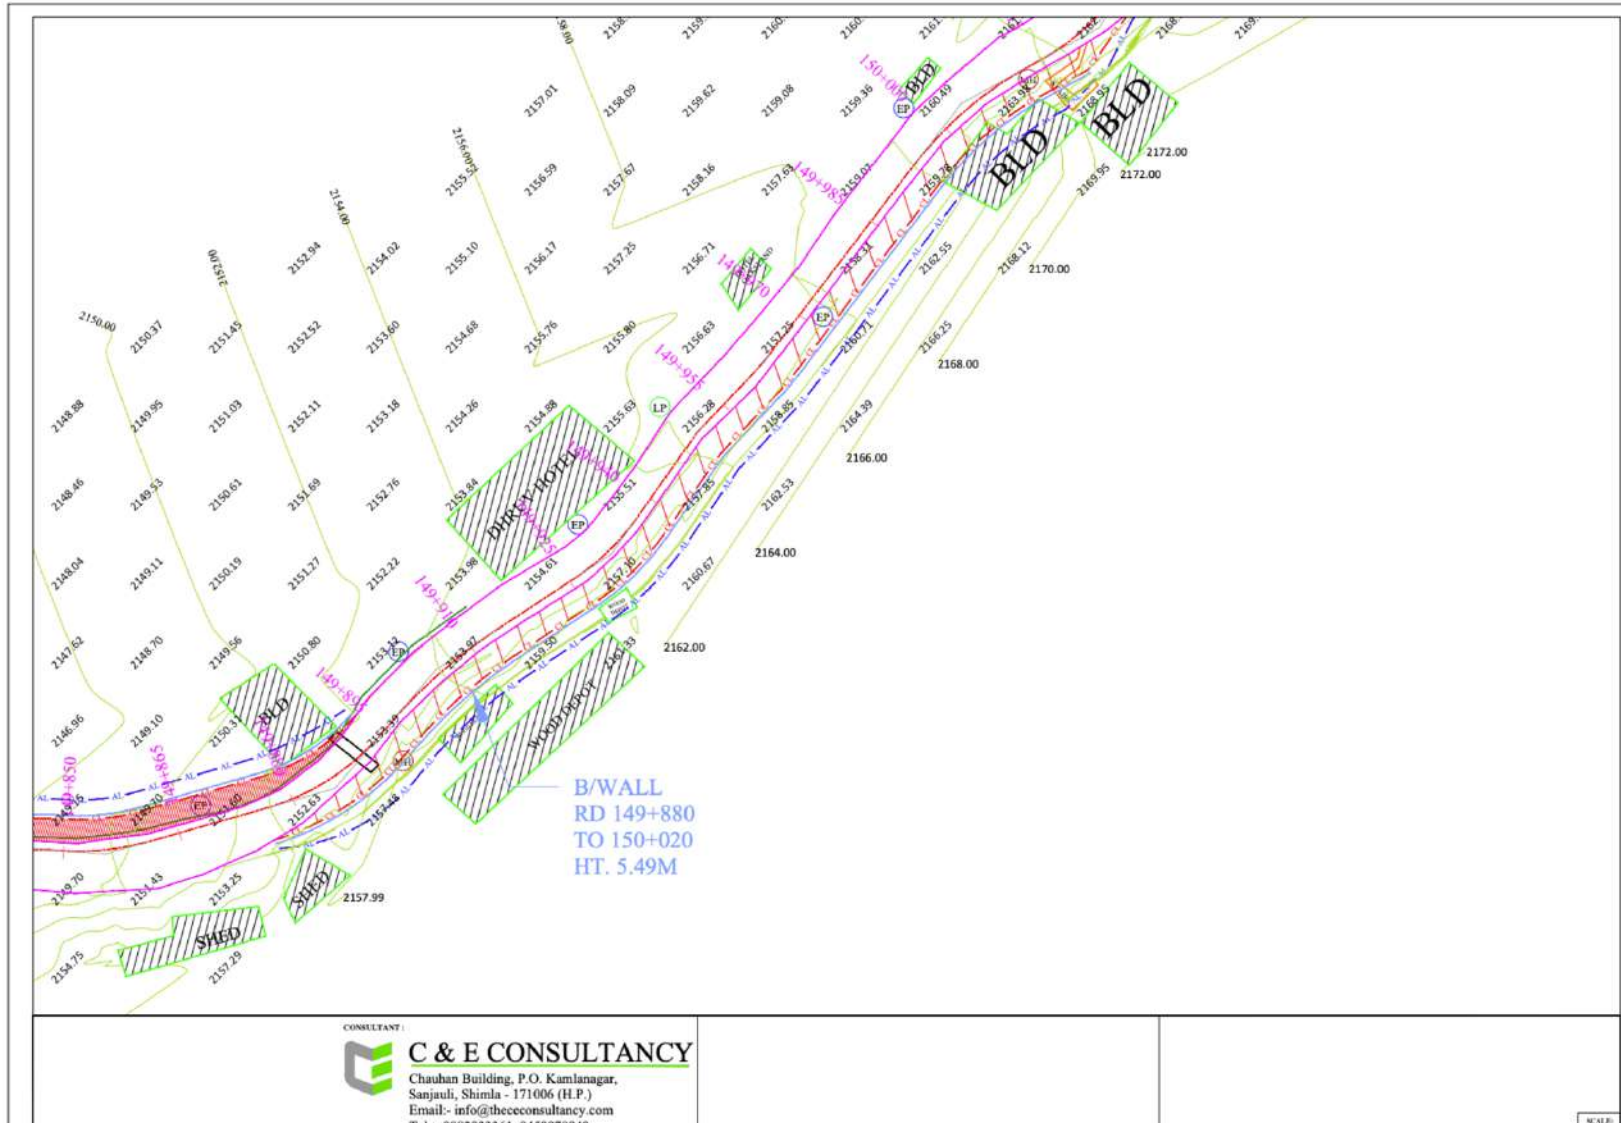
Proposed Road Design for the Improvement of MDR-67 Road Section (Victory Tunnel to Auckland Tunnel) - 12
